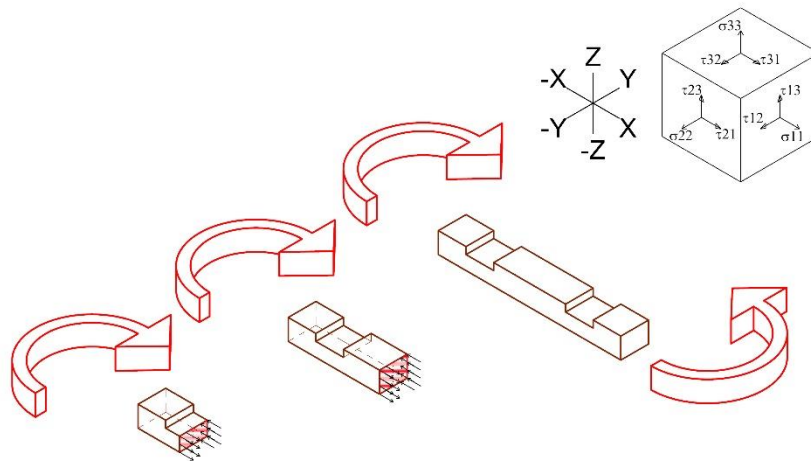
Cross Piece -Bending Moment M_z on Z axis
